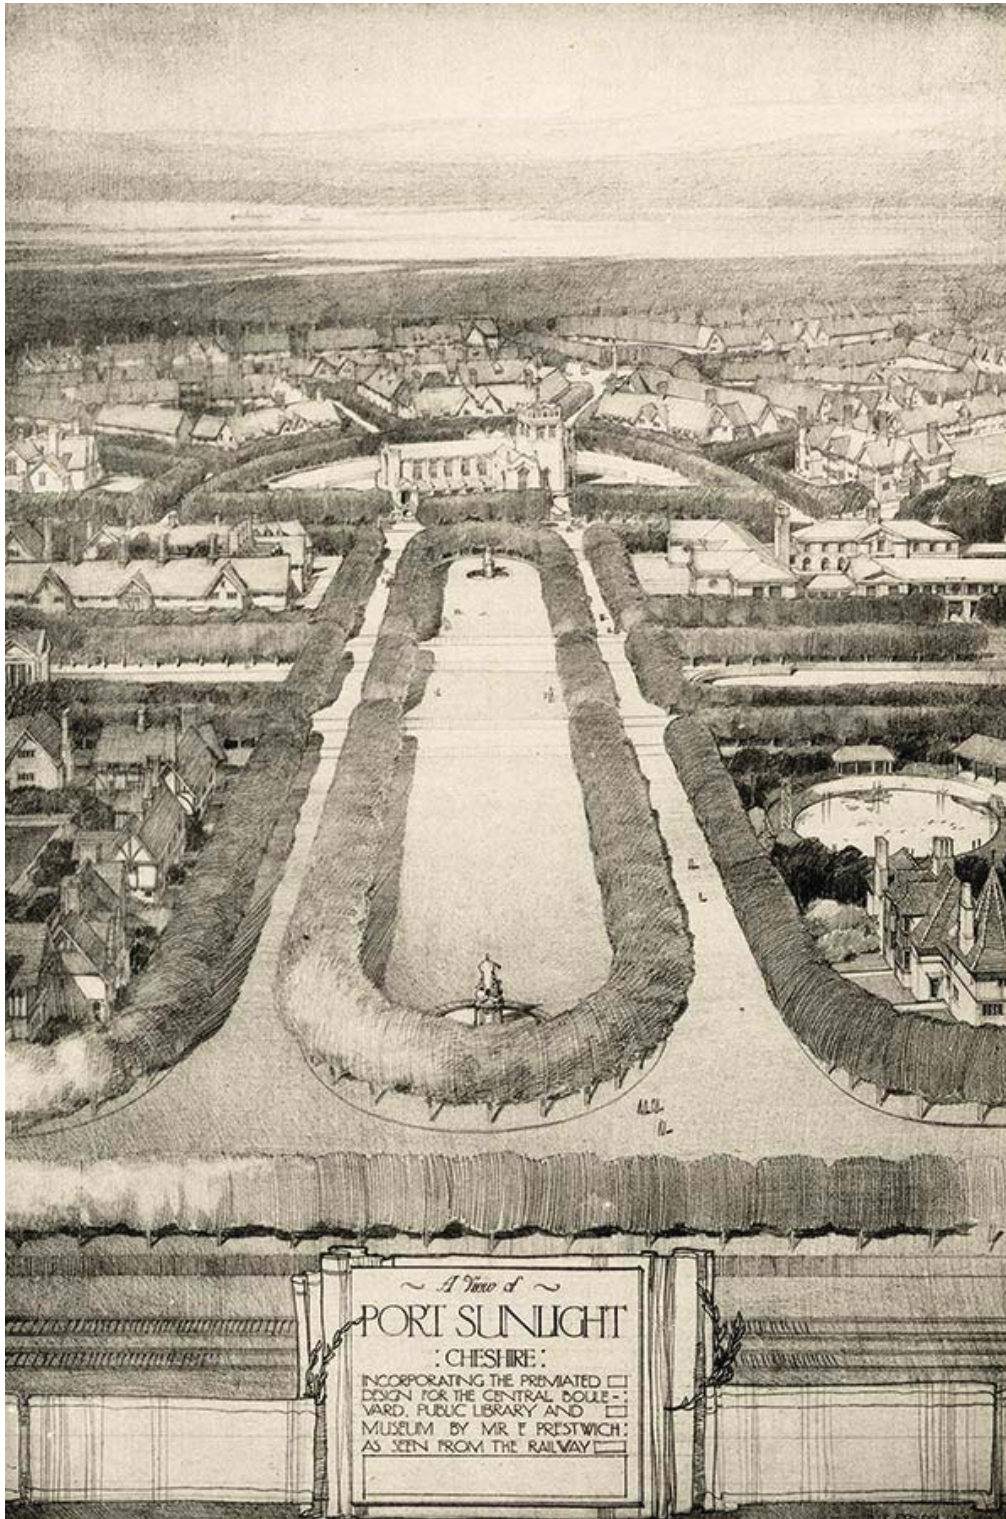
1910 Ernest Prestwich's sketch about his plan for Port Sunlight.
